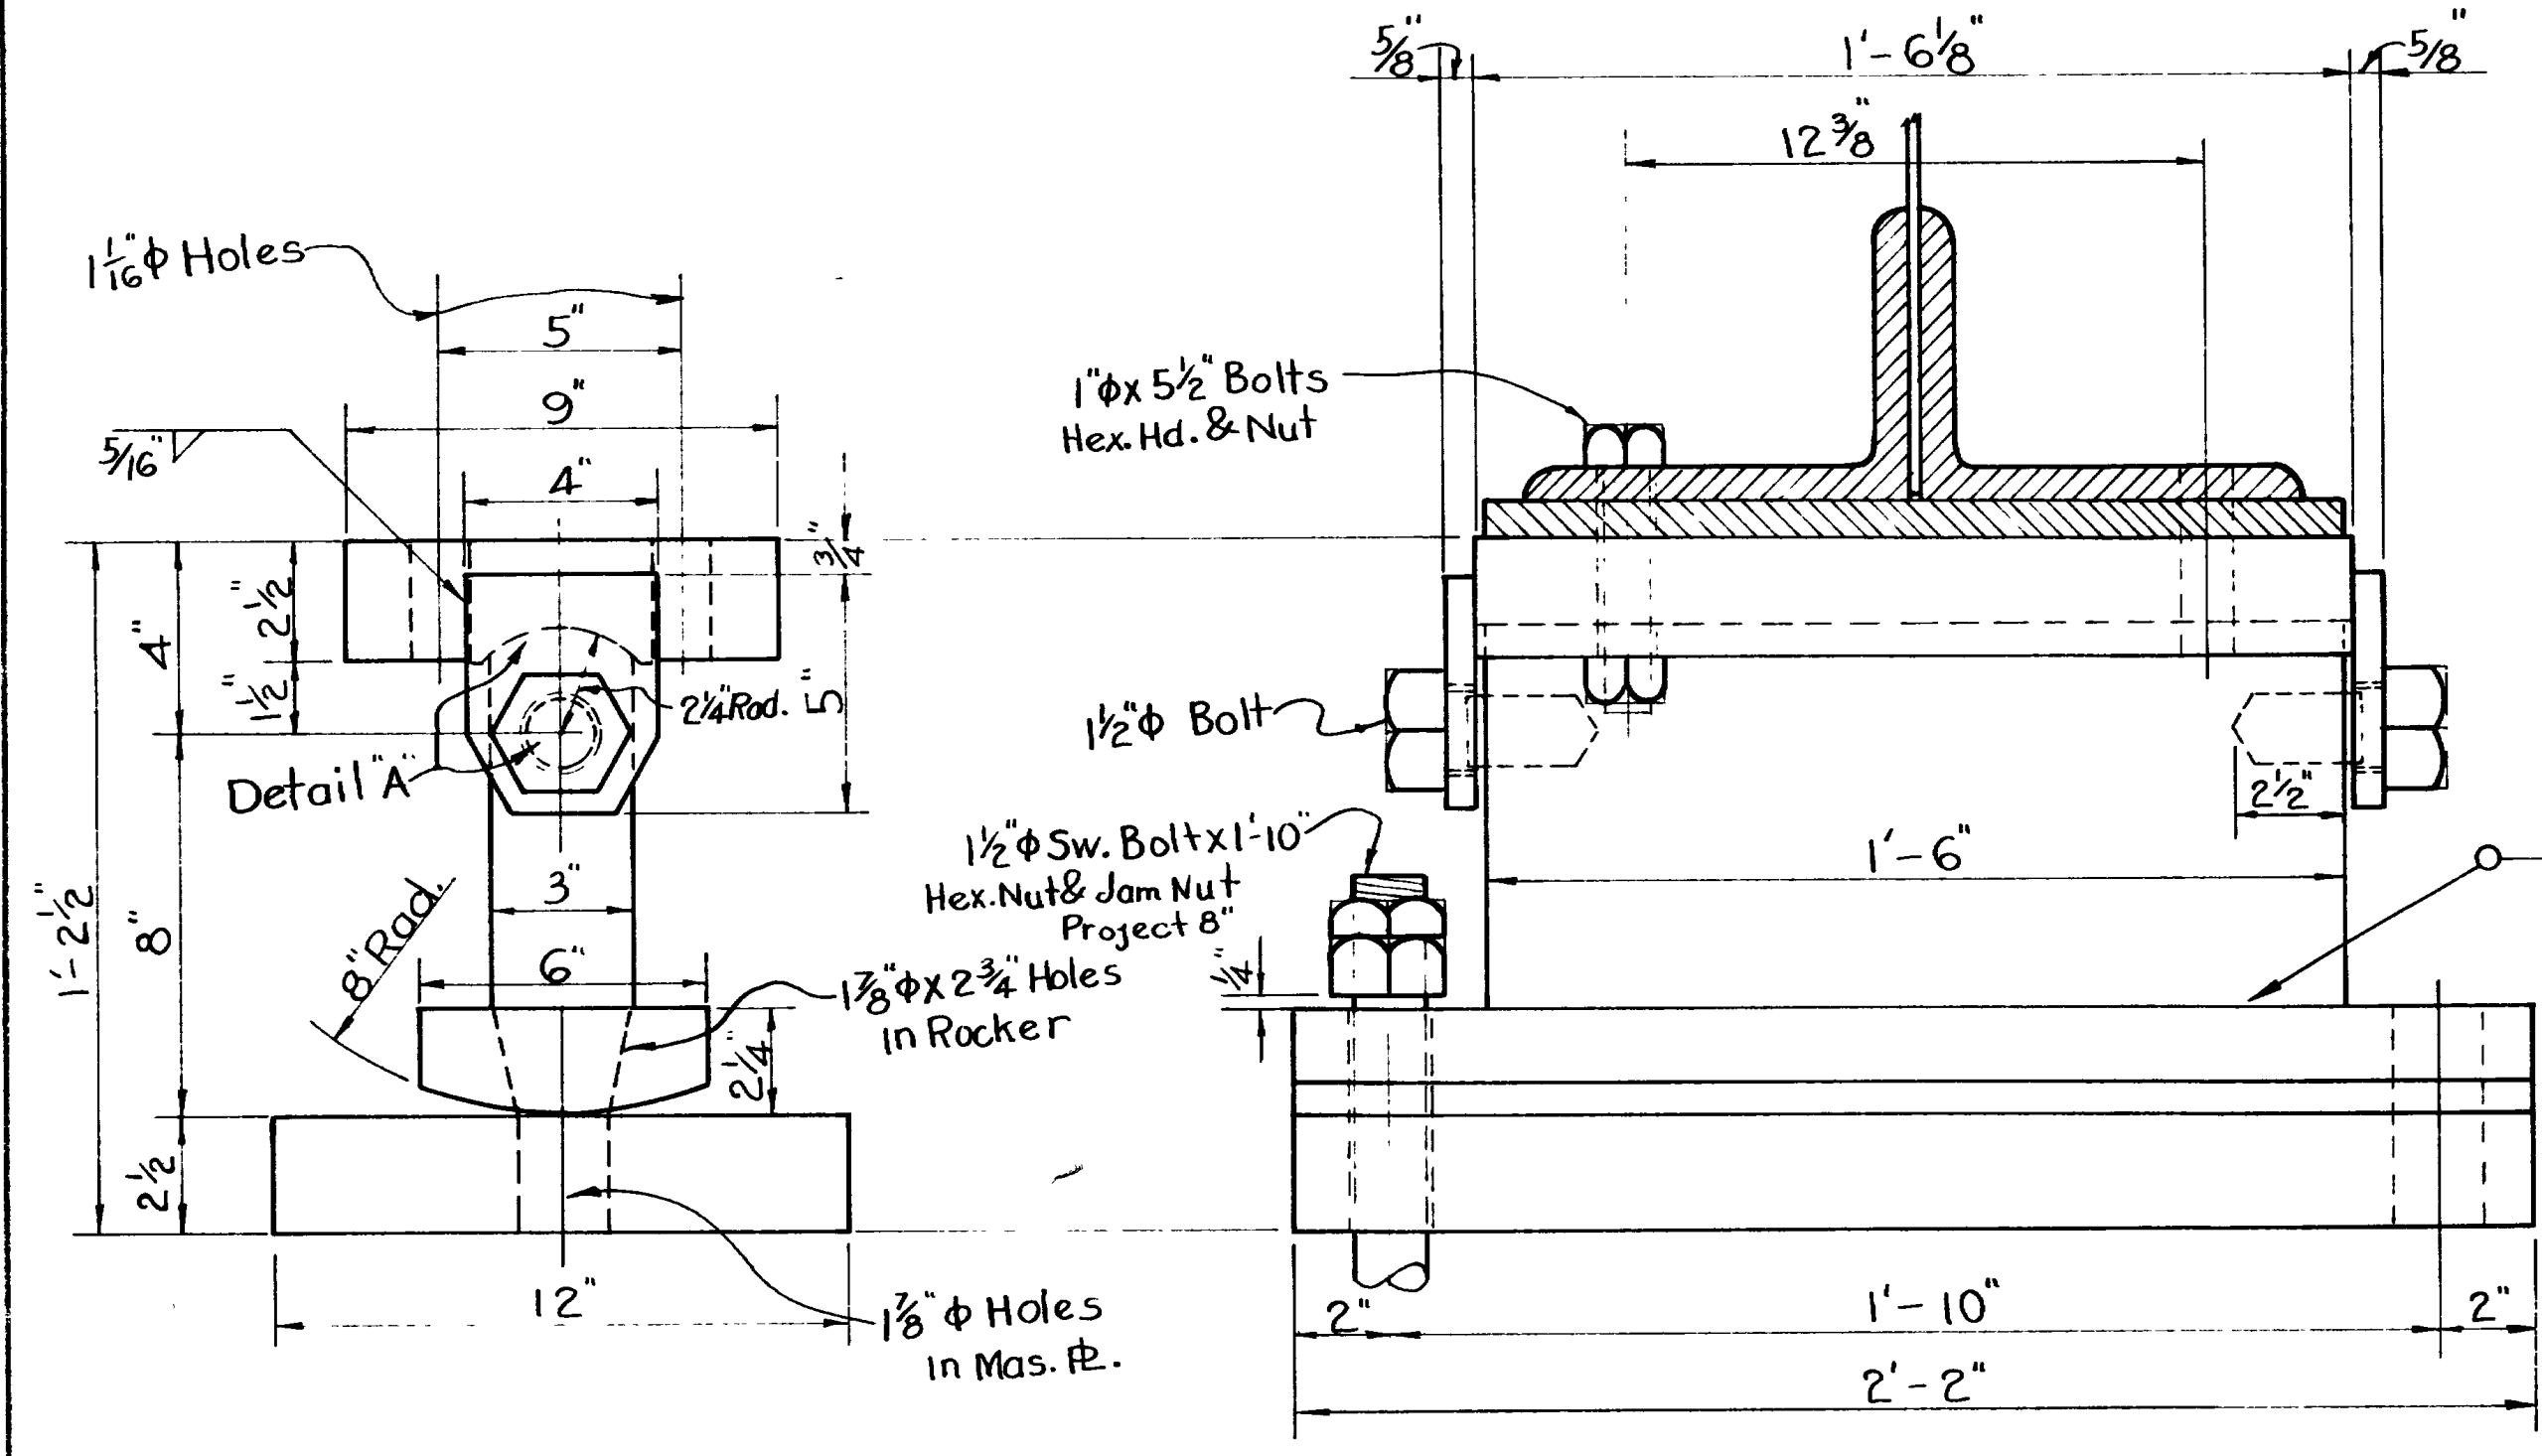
DETAIL OF SLAB EXPANSION UNIT AT ABUTMENTS "A"
